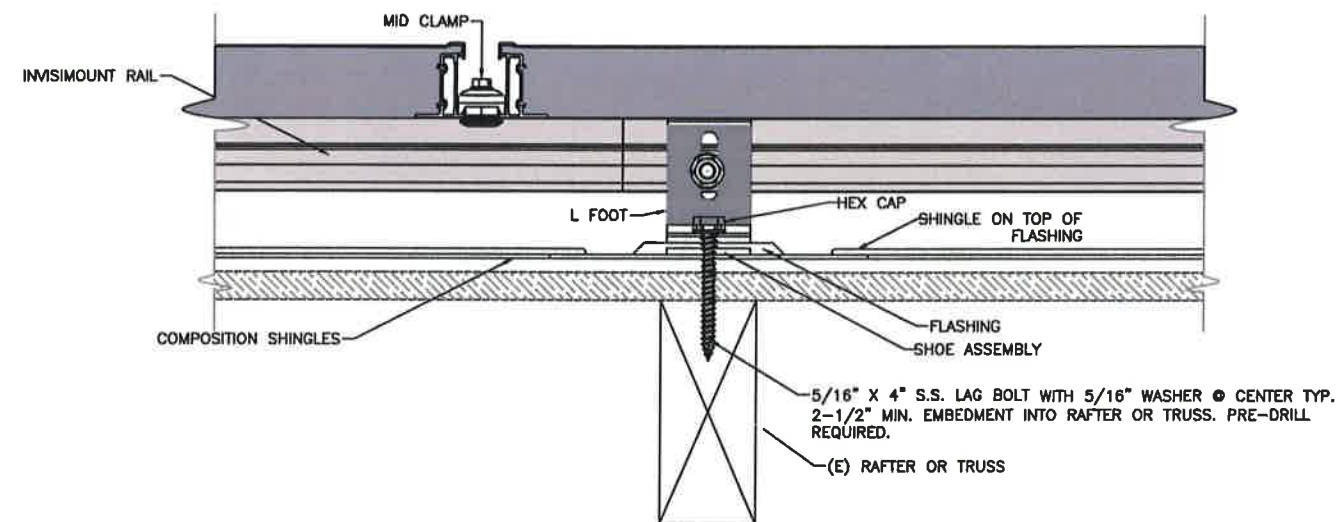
INVISIMOUNT ROOF ATTACHMENT DETAILS @ RAFTER OR TRUSS
